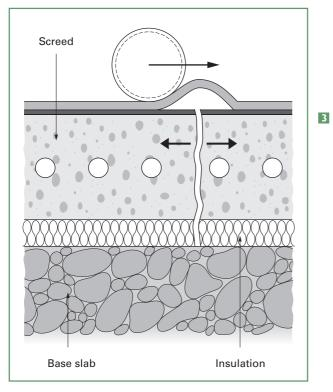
Cracks caused by drying shrinkage may be live due to imposed thermal movement, and may cause ripples in thin flooring. This could be exacerbated by heat concentrating locally through the crack, softening the sheet flooring. ©The Concrete Society.
